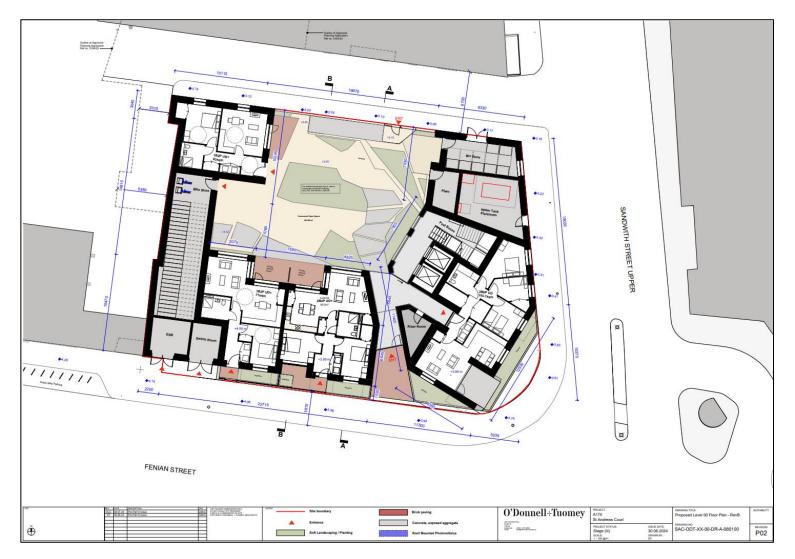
PROPOSED SITE LAYOUT (DRAWING NO. SAC-ODT-XX-00-DR-A-080100 REV P02, EXTRACTED FROM DCC, CITY ARCHITECTS DIVISION, 2024)
